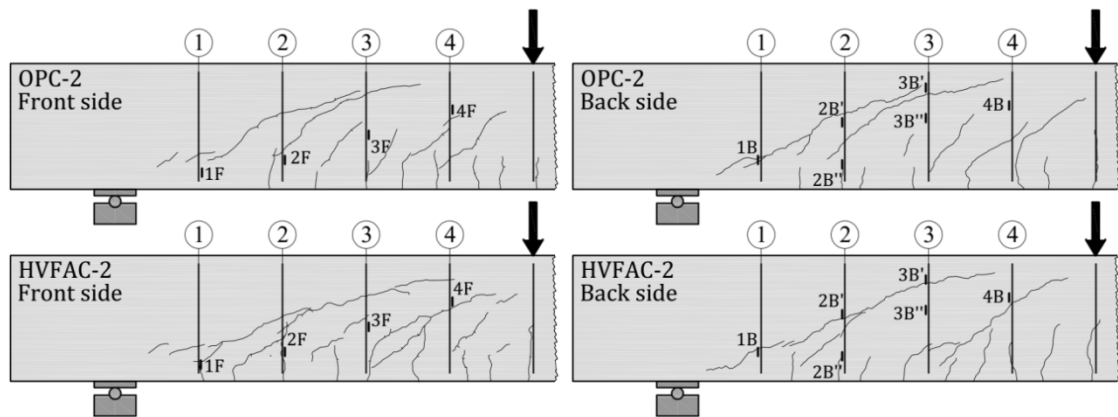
Crack patterns prior to failure in beams OPC-2 and HVFAC-2
